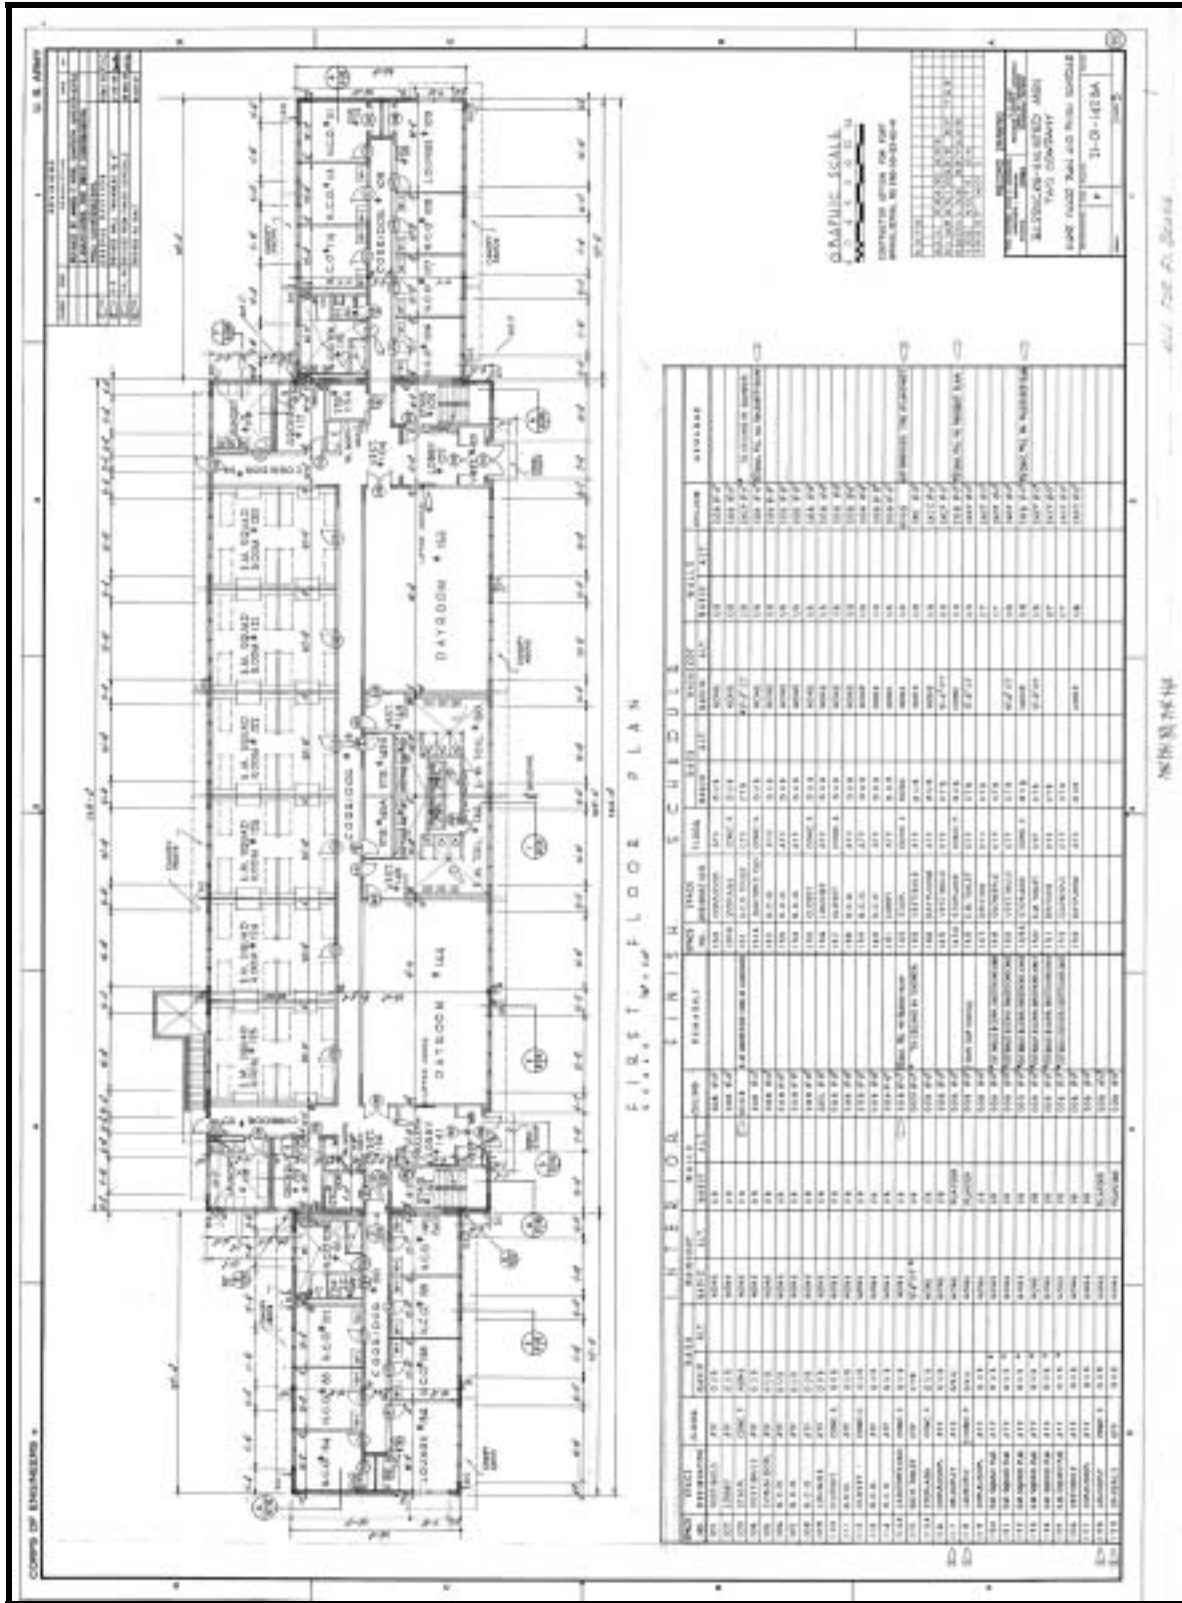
Rolling Pin, two-company barracks, first floor plan, Ft. Bragg (ca. 1959, revised 1967) (Engineering, Ft. Bragg).
